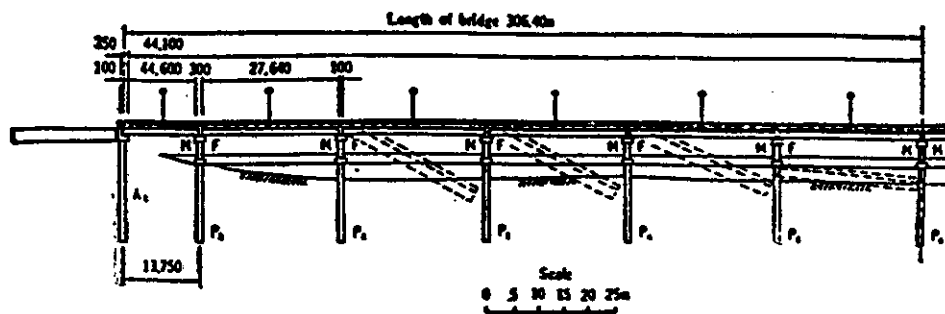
Profile of Showa-Bridge Showing Damage to Deck Slabs Due to Out-of-Phase Motions of Piers (Fukuoka 1966)
